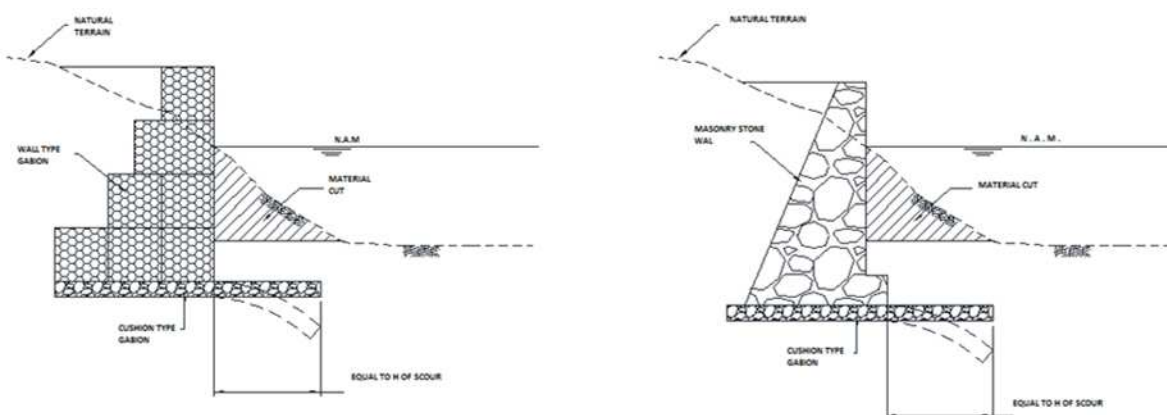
Types of protections for bank walls with cushion type "Reno" (gabion type). (SPOP, 2014)
